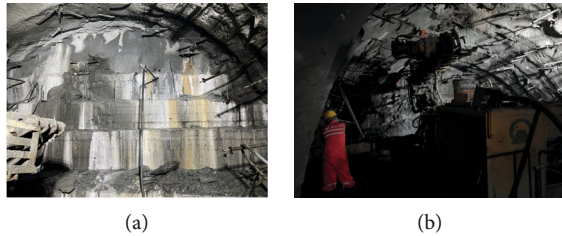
Project implementation. (a) Wall for grouting. (b) Grouting reinforcement.
